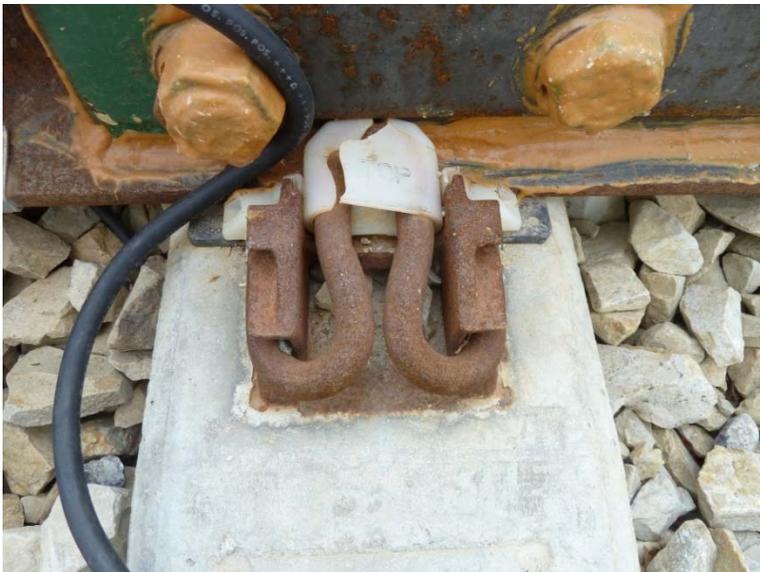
Cracked Insulation Cap on the Fastener Clip
